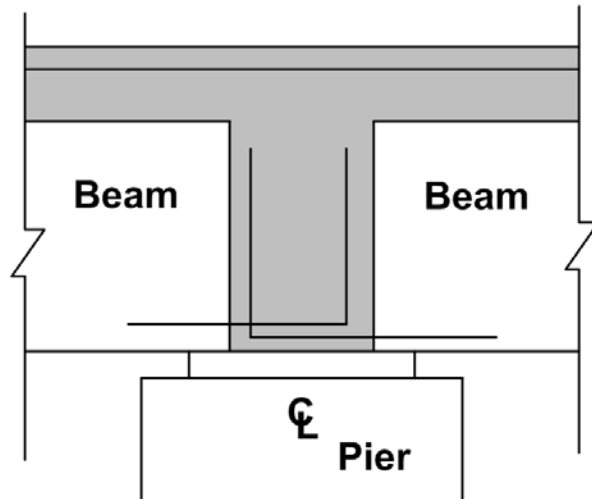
Continuous Prestressed I-beam Schematic
